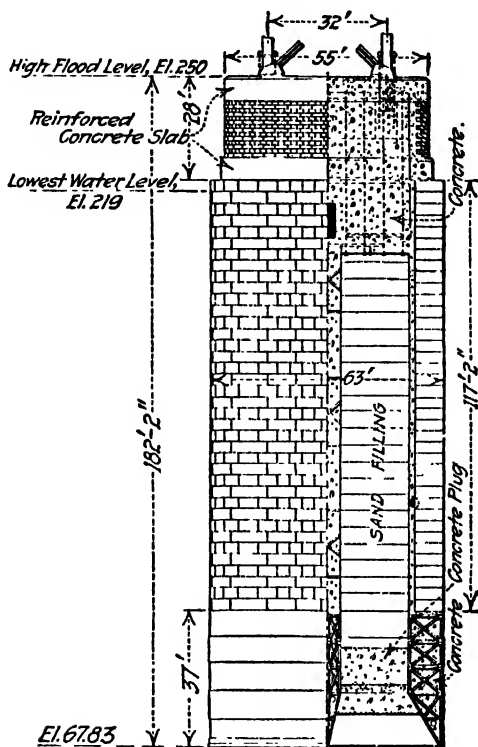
Metal Open Caisson with Dredging Wells for Hardinge Bridge.
